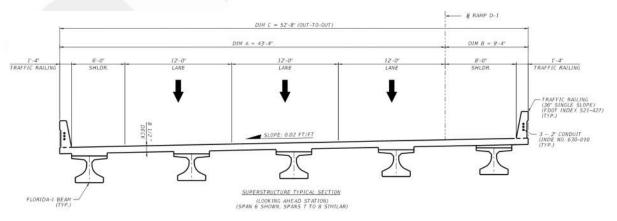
Bridge Typical Section (Bridge No. 13) 2 of 2
